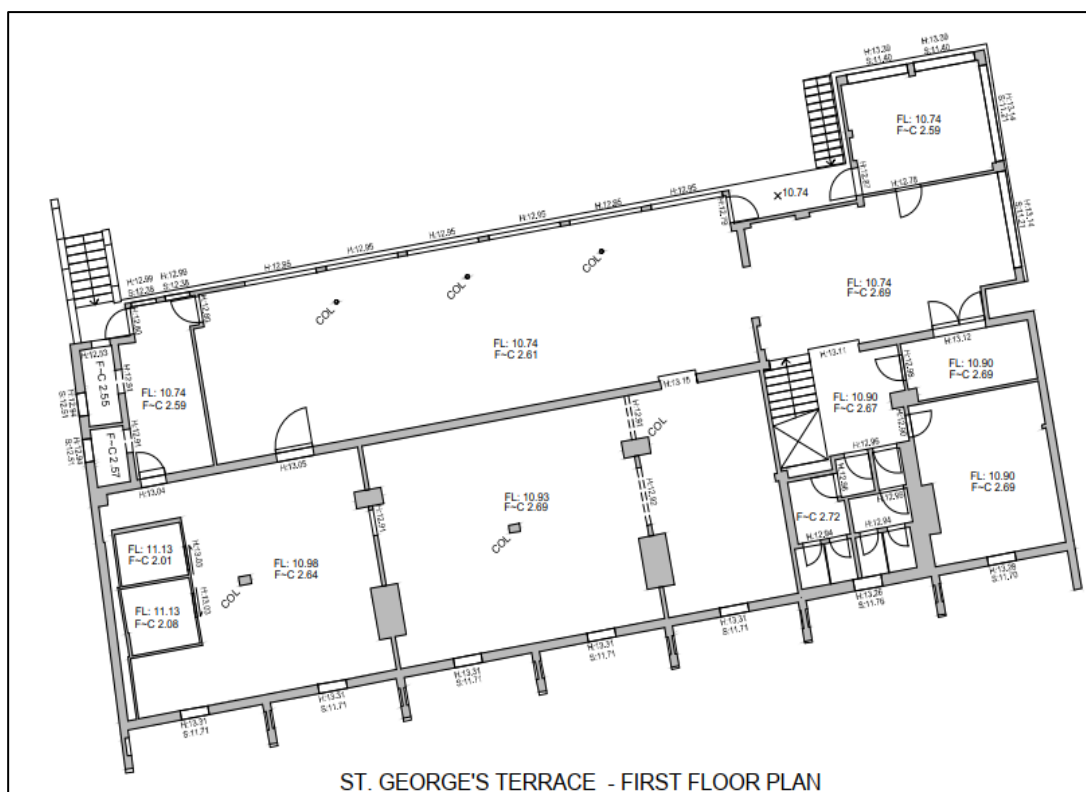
St George's Terrace first floor plan (Source: LTS Lockley, 2020).
